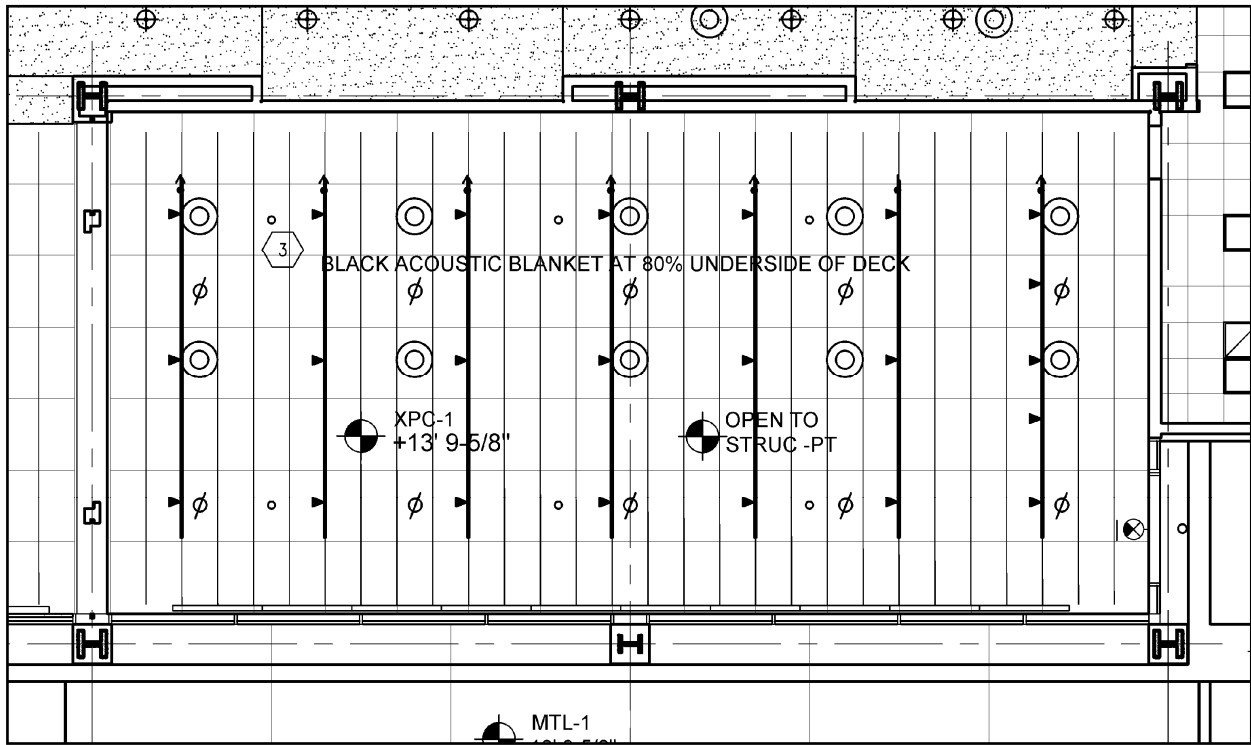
| Music Café Reflected Ceiling Plan – Existing Design [Not to Scale]
